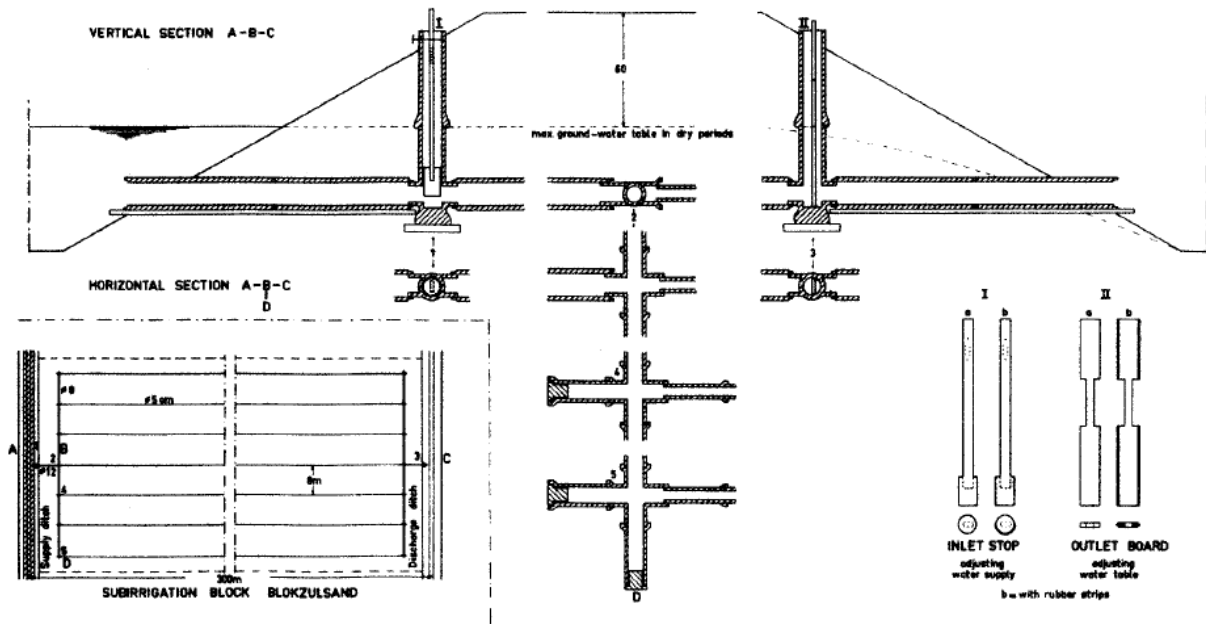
Plan and some details of an irrigation block on fine Blokzand. The inlet stop and the outlet board are presented with (b) and without (a) rubber strips. Rubber strips are fitted to prevent leakage. The outlet board represented here can also be used in reversed direction for a 10 cm lower height of the impounded water level.
